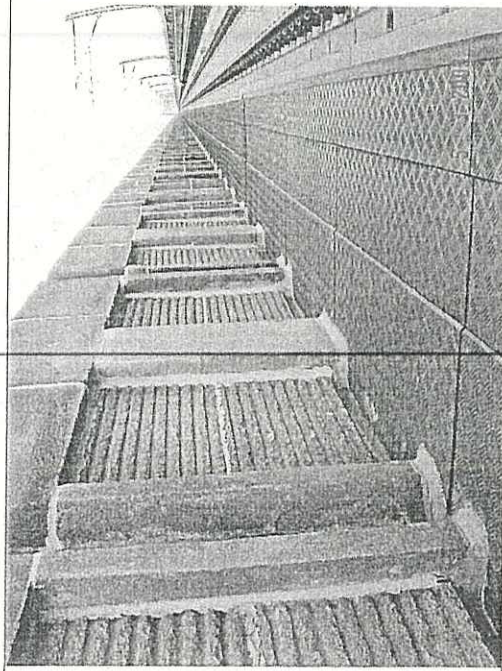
Sound Absorptive Material (SAM) on Parapet Wall
